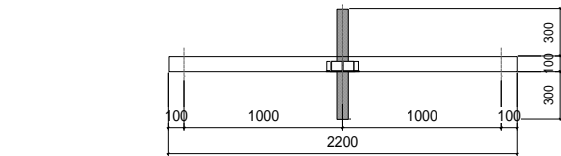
Sectional elevation of specimen (H00-06-I)
